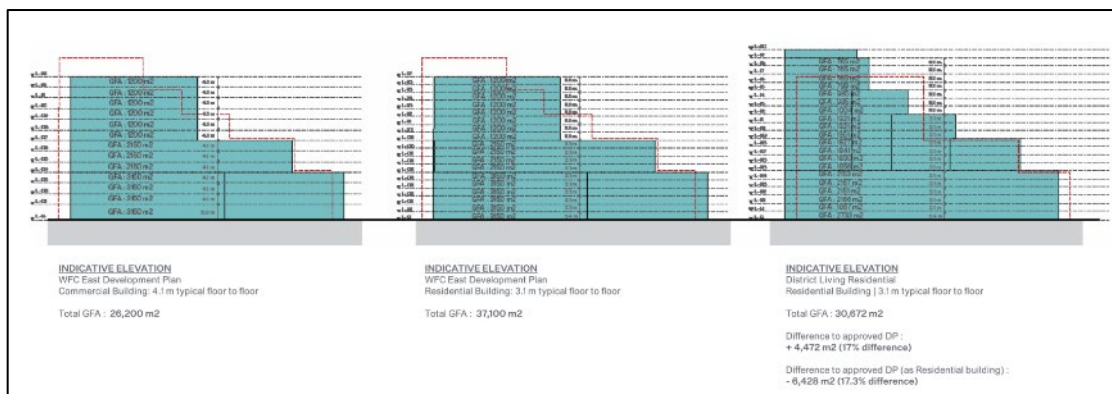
Gross floor area analysis of Building 05 (source: Urban Context Report)
